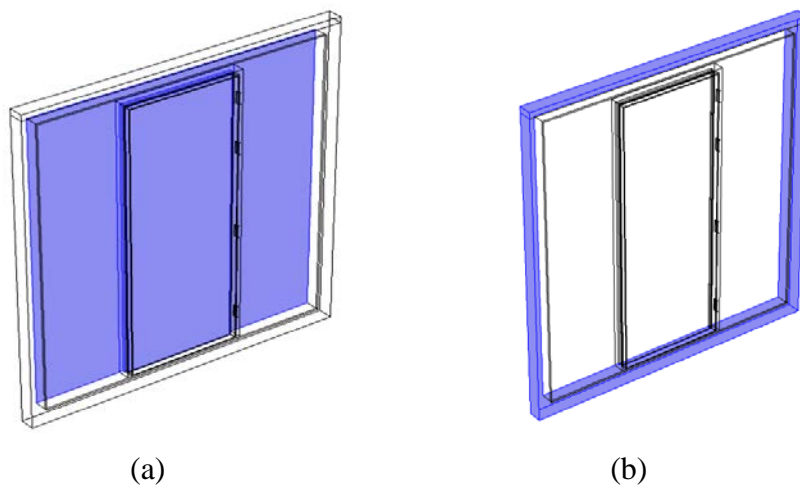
Radiation boundary of (a) the door and the concrete wall and (b) steel frame
